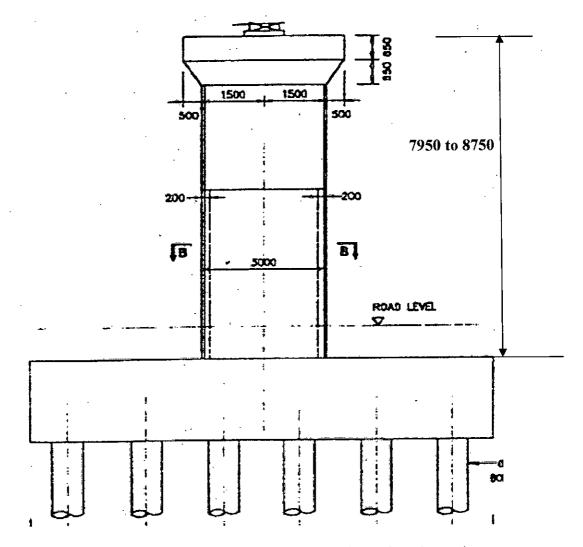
Elevation of Pier (P11 & P12) (All Dimensions in mm)
